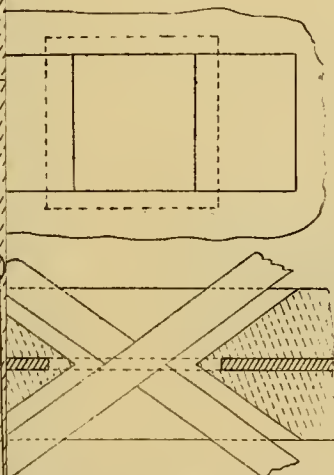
PLACING CONCRETE PROTECTION ON WEBS OF NEW CITY FLOOR BEAMS.
